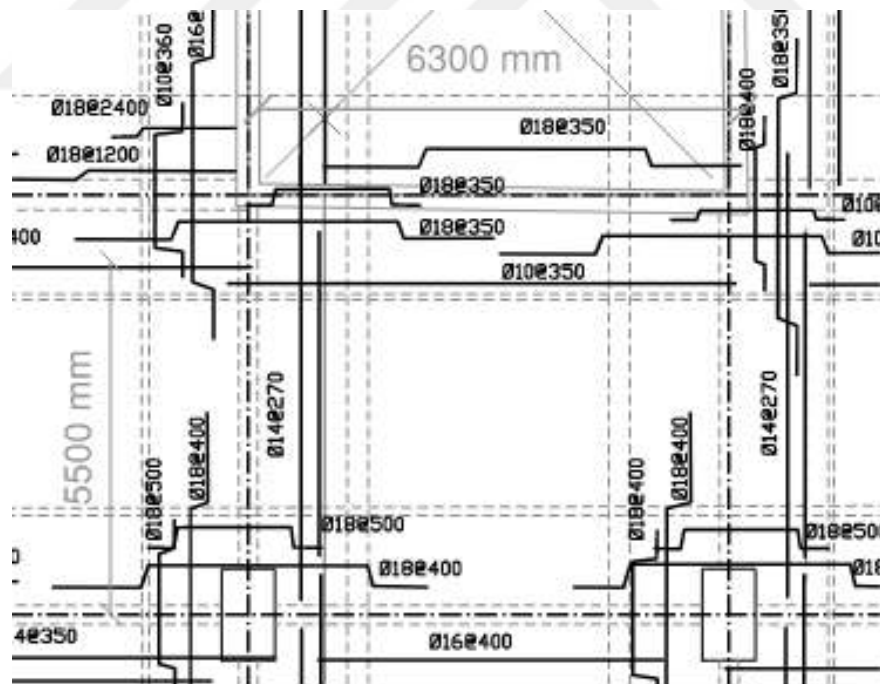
Column strip Steel Reinforcement Details for Panel (6.3x5.5) Model (6.3-5.5-5.2).
